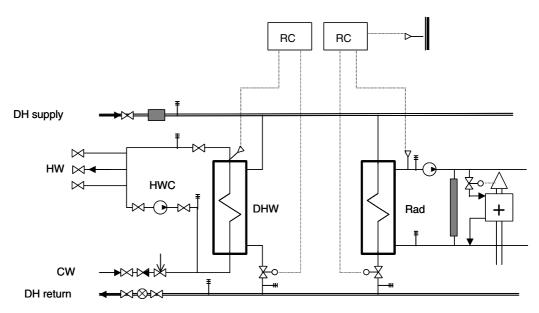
Parallel connected substation for multi-family buildings including ventilation preheating system
